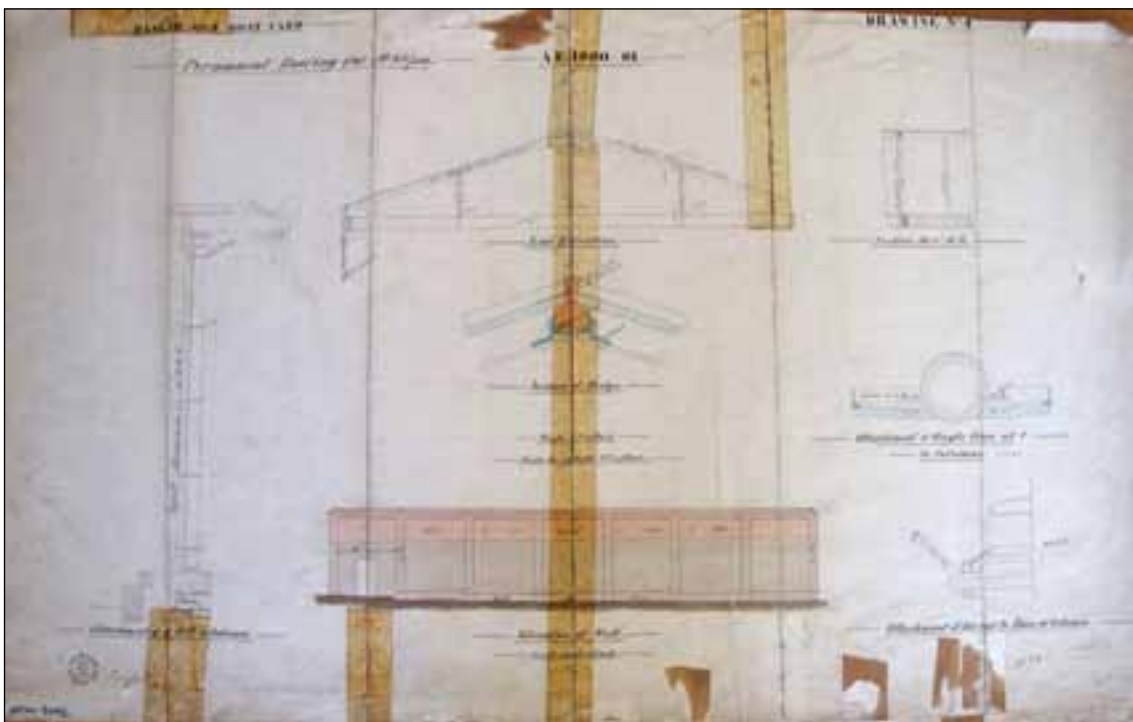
Plan for permanent roofing for 10 slips in 1860 (EHA MD 95/6493)
